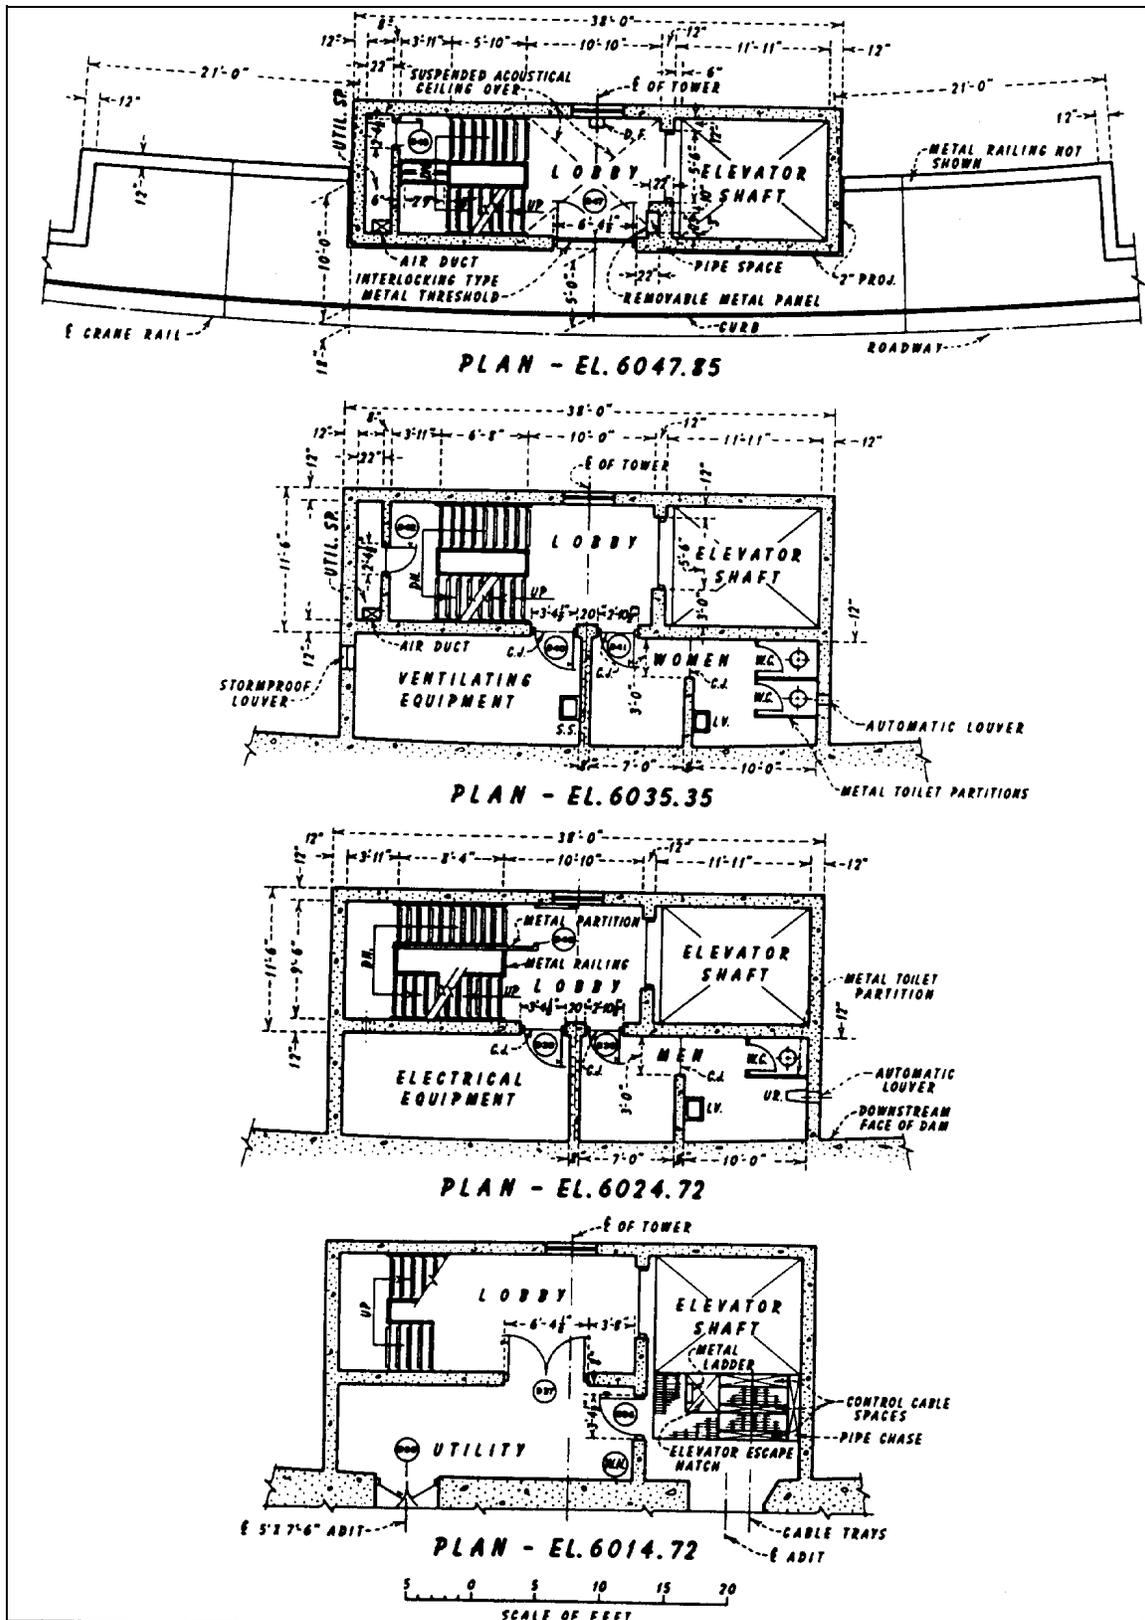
Details of layout of elevator shaft and tower in Flaming Gorge Dam (USBR)
